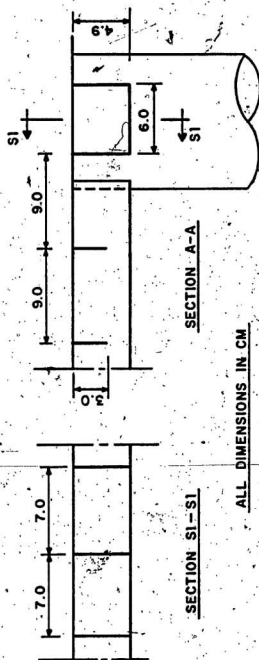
e DETAILS OF MAIN GIRDER AND DECK FLOORING
